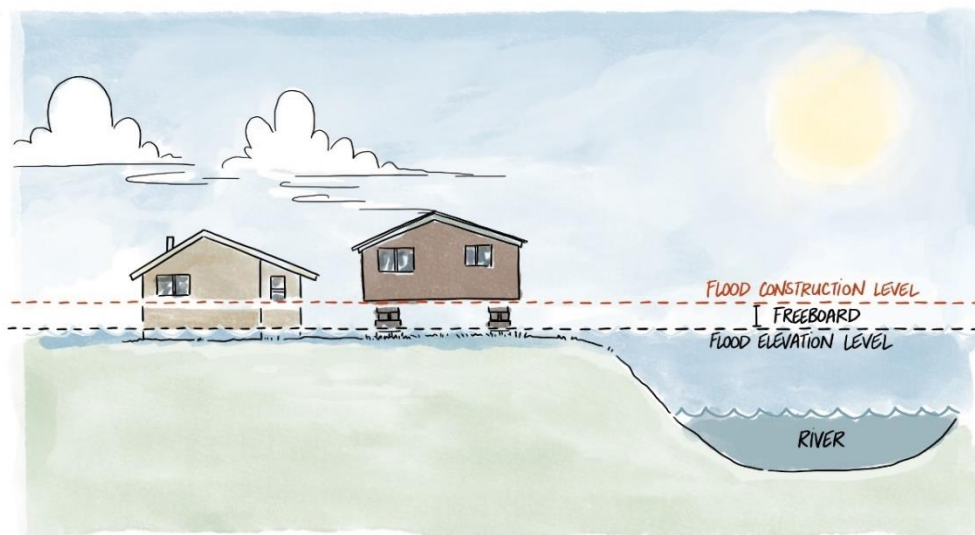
An illustration explaining the relationship between the flood construction elevation, freeboard elevation, and base flood elevation.
